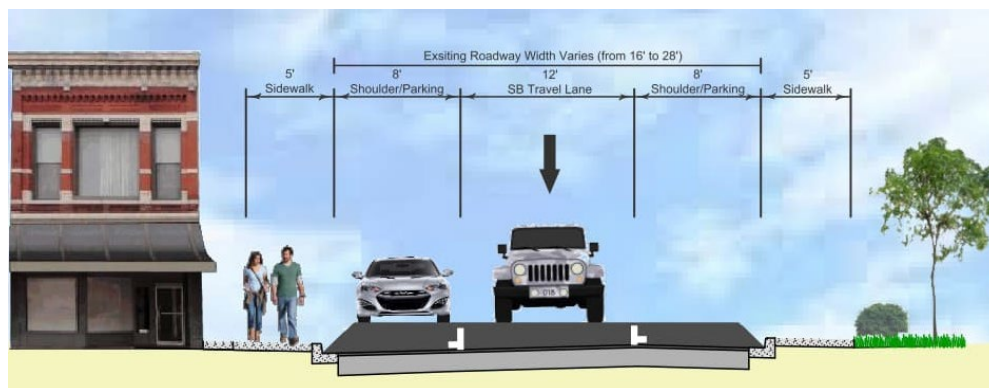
Existing Typical Section MD 272 (Main Street) US 40 to Russell Street to Irishtown Road
